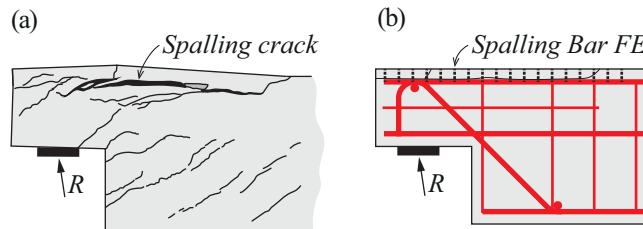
Spalling failure of a dapped end beam (a); Introduction of spalling FE (b)
